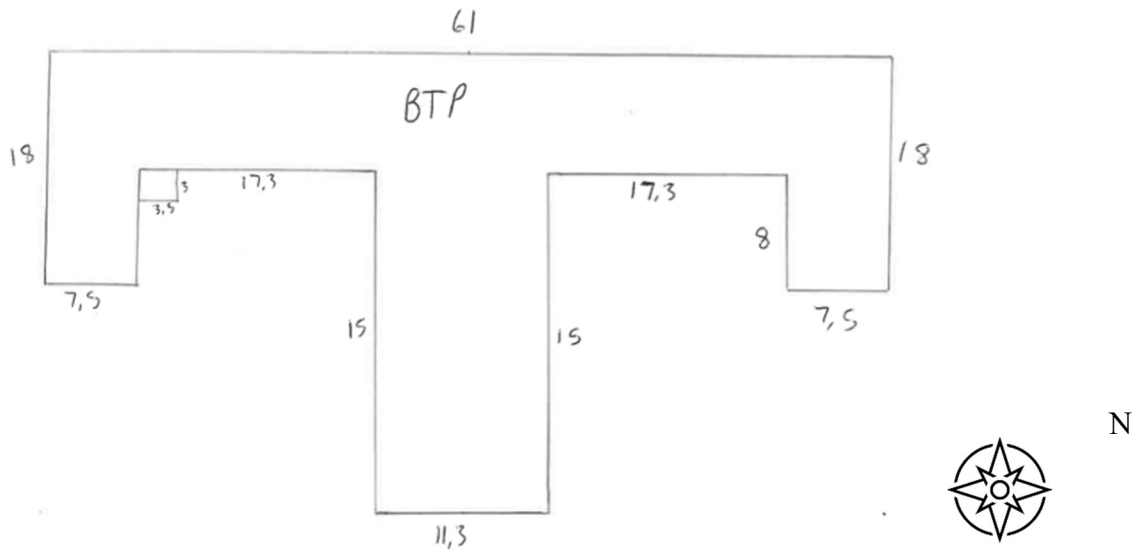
An estimated floorplan of the Biotechnology Platform Building (aka Building 38), ARC Onderstepoort Campus, 100 Old Soutpan Road. Note: Roof measurements for bidders to confirm at mandatory site visit.
